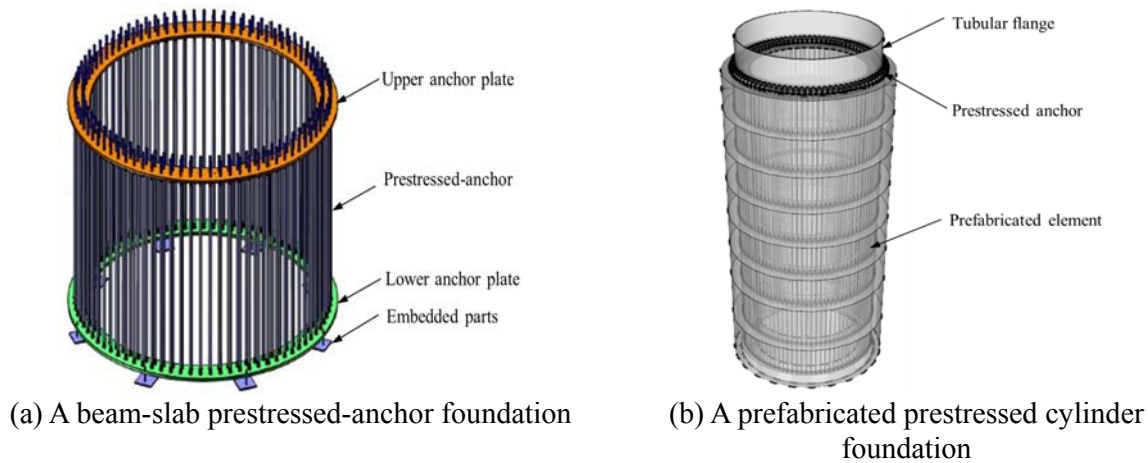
New-type Foundation Forms for Wind Tubular Towers
